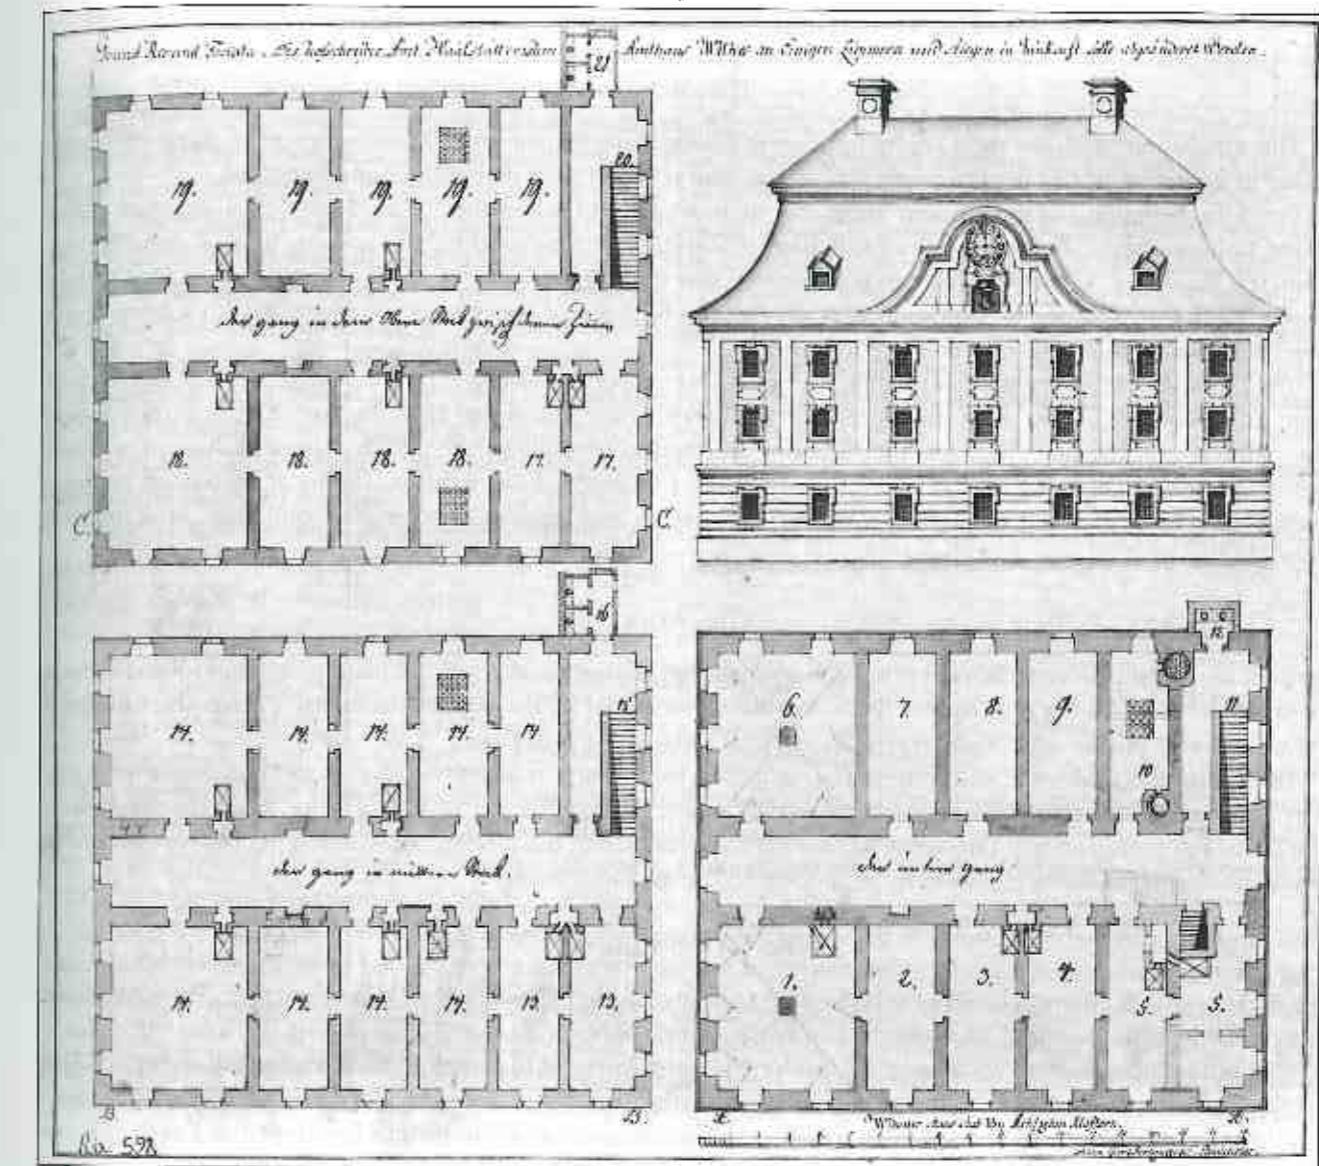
Amtshaus, Section (Idam/Buxbaum)
